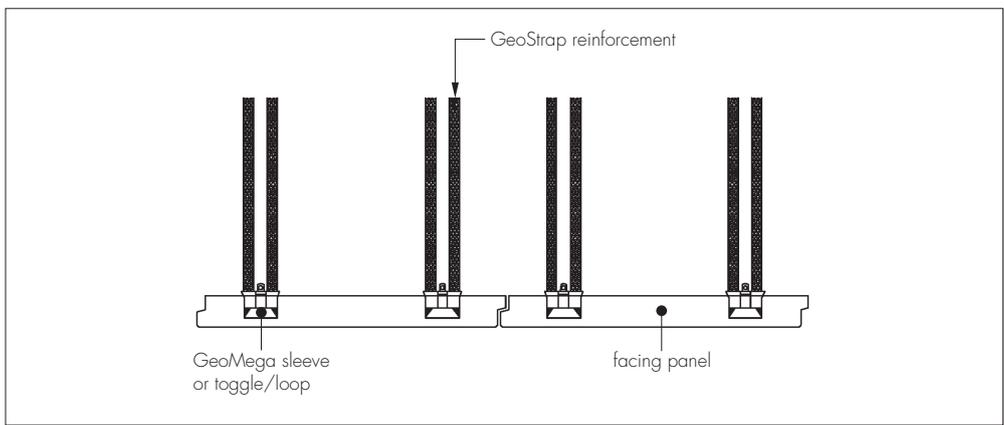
Typical reinforced soil structure — diagrammatic plan view
